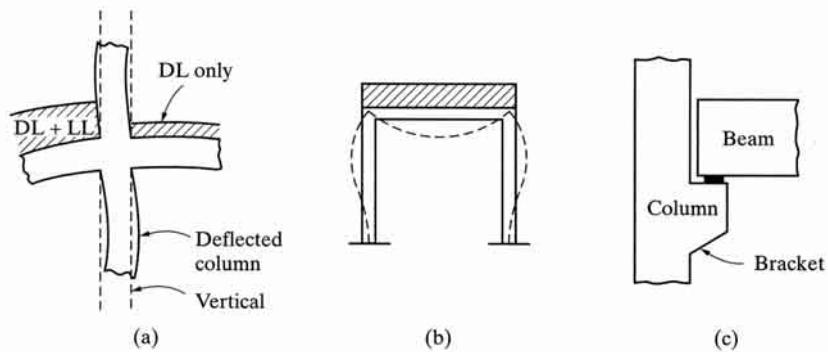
Eccentric loaded conditions (Spiegel, 1998)
